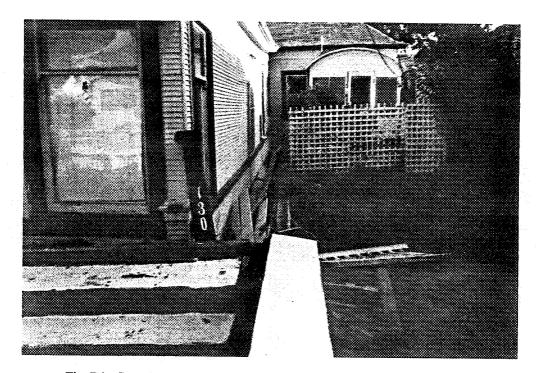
Complete collapse of cripple wall and destroyed porch partly due to foundation settlement - 130 Brennan Street in Watsonville
